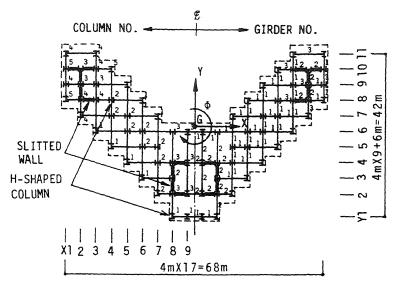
TYPICAL FLOOR FRAMING PLAN
